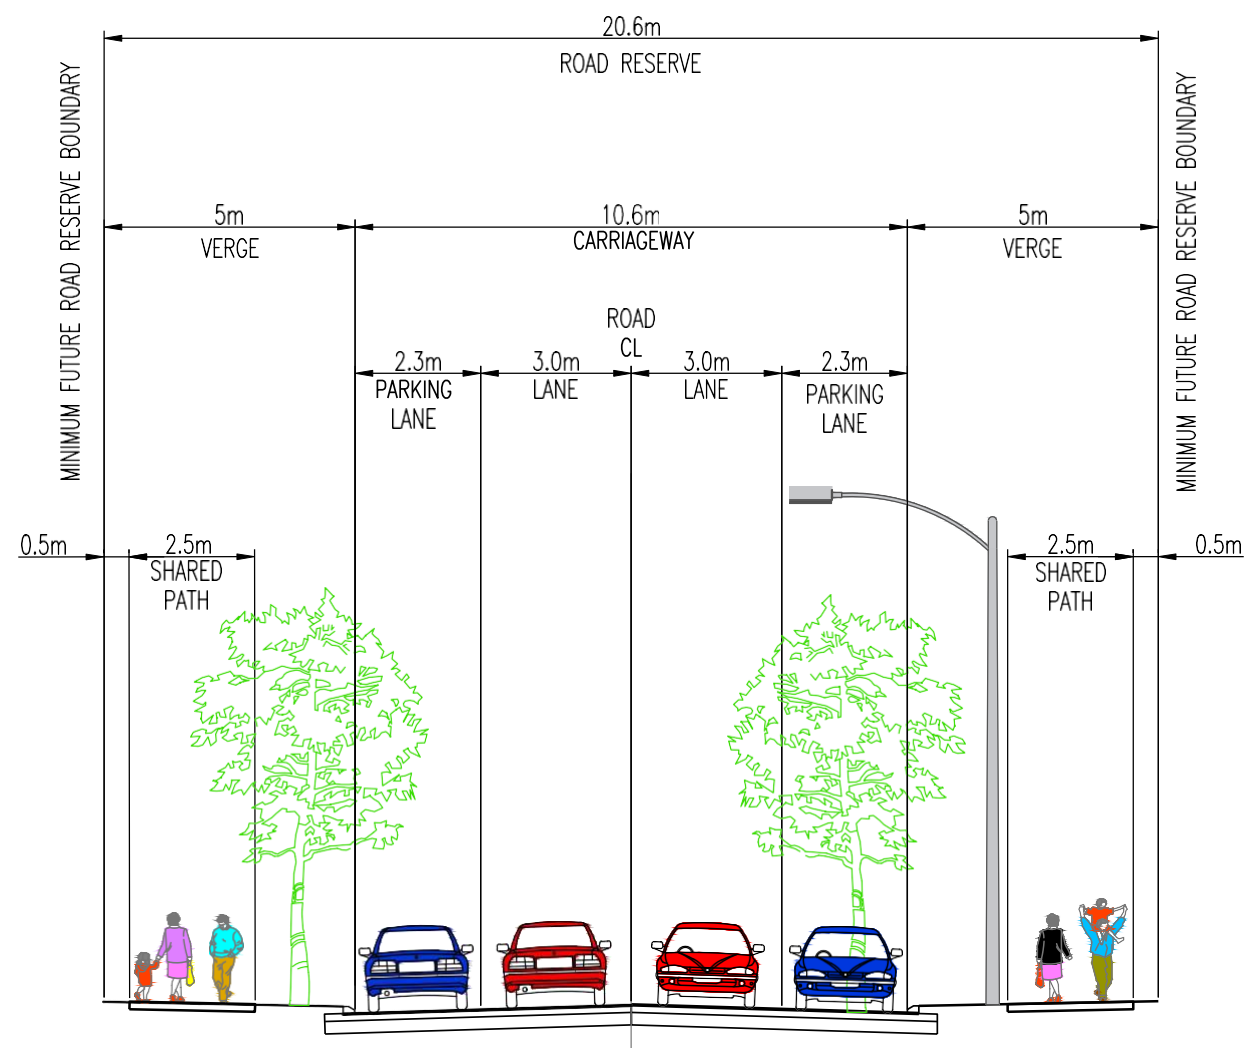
CROSS SECTION OF ACCESS STREETS B
